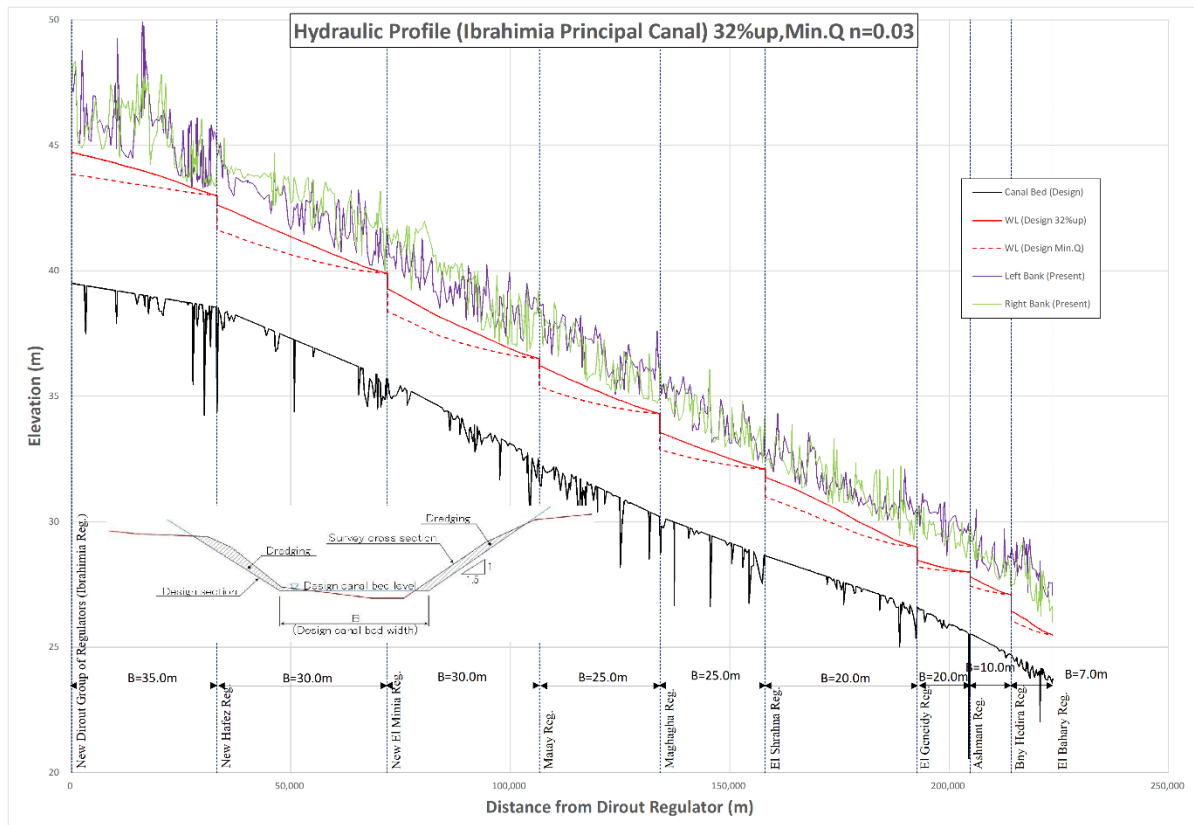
Hydraulic Longitudinal Profile of Ibrahimia Principal Canal (Maintenance Plan: 32% up & Min.Q)
